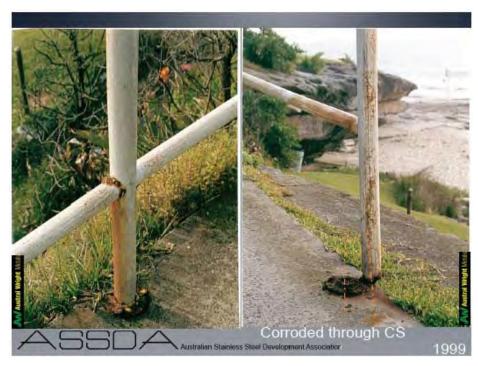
Corroded Steel Handrail (ASSDA)
